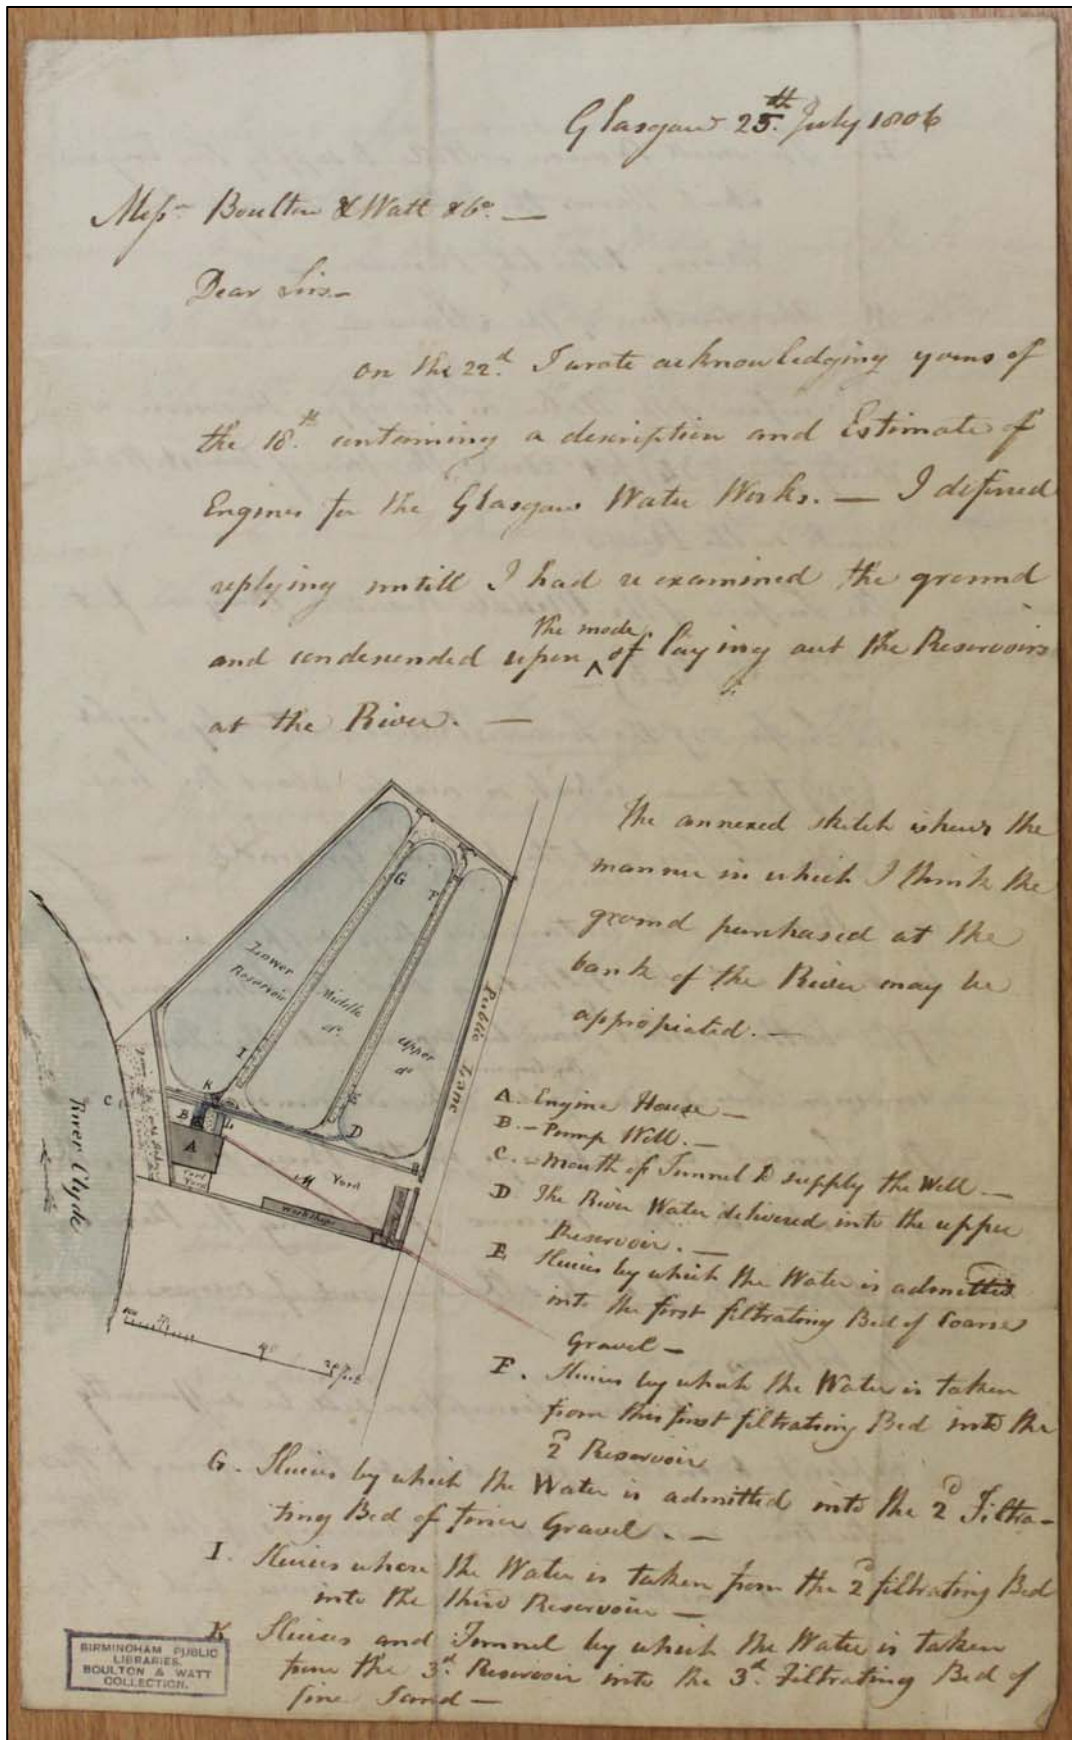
Detail of Sketch Plan by Thomas Telford, Showing Layout of Original Build
